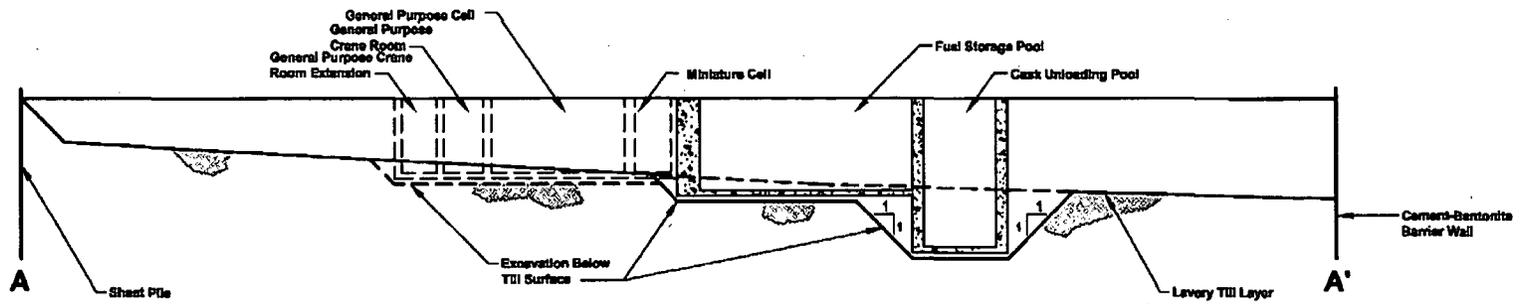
Conceptual Layout of WMA 1 Excavation
